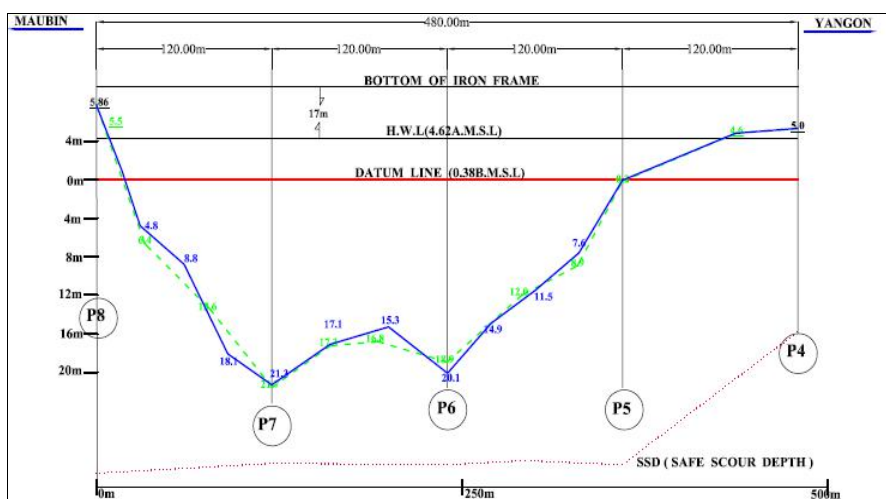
Cross sectional profile of design foundation of Maubin Bridge
